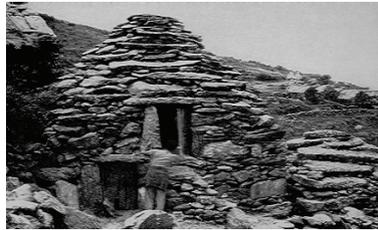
Stone primitive square plan construction: two floors oven in Branda do Real, Serra da Peneda (Veiga de Oliveira et al., 1969)
